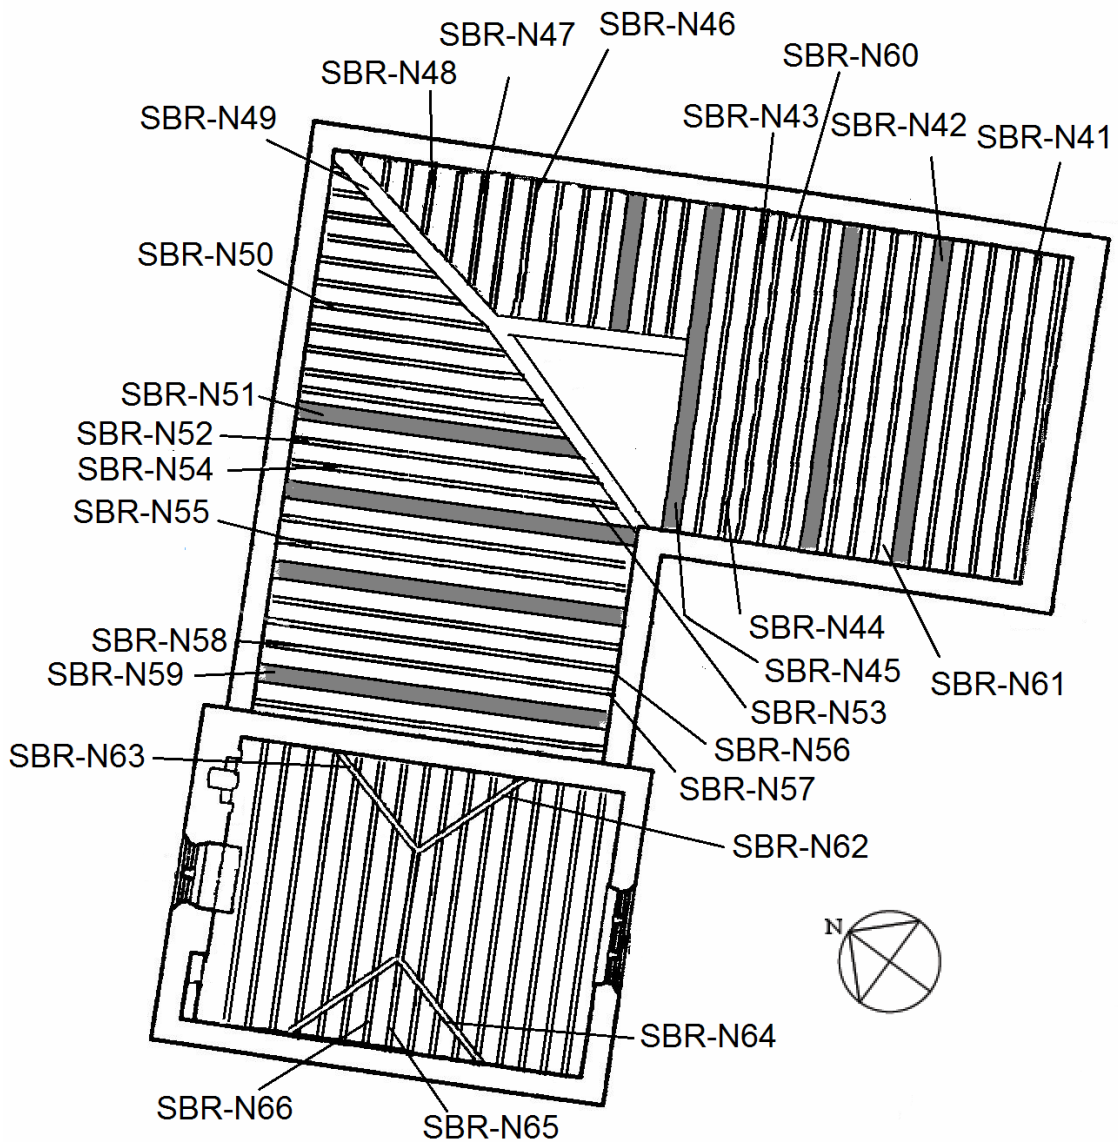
First-floor plan, showing the location of samples SBR-N41–66 (Blackett-Ord Conservation)
